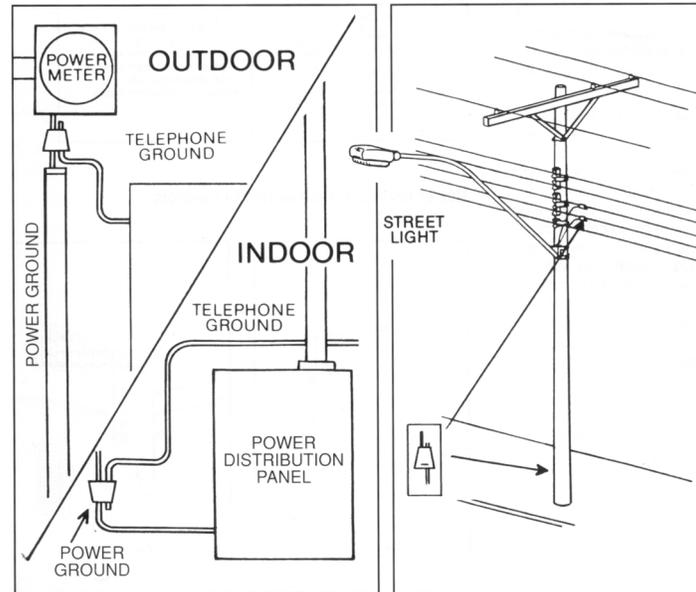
Power meter, distribution panel, and street light grounding examples. (Source: Courtesy AMP Inc.)
